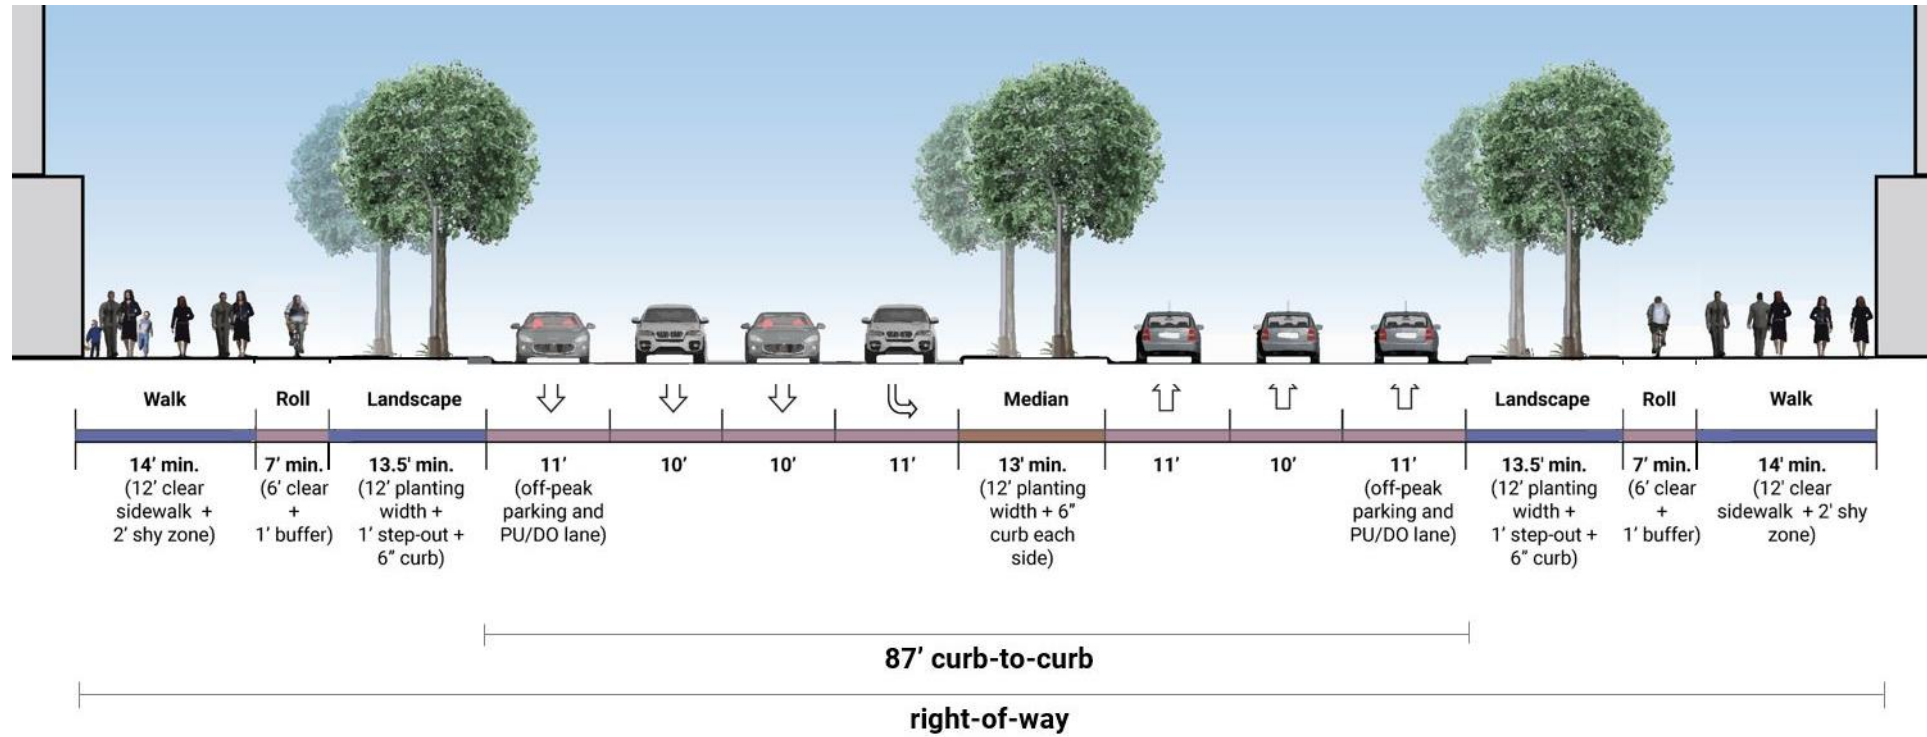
Recommended cross section from 18<sup>th</sup> Street to the north.
